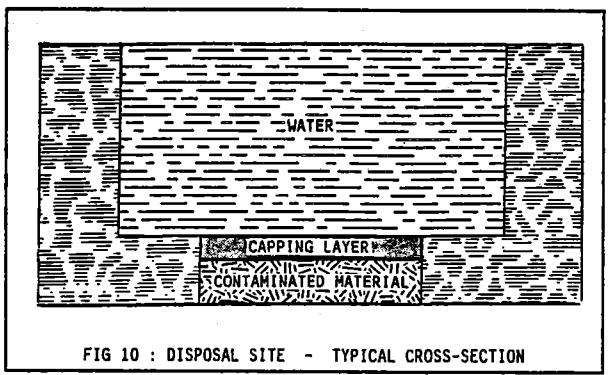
DISPOSAL SITE - TYPICAL CROSS-SECTION
